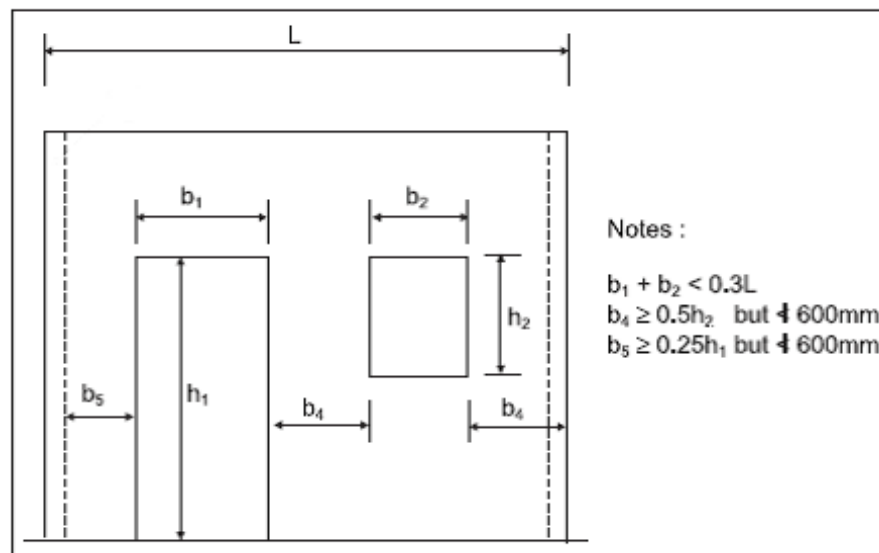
Recommended openings in rubble masonry (IAEE 1986)
